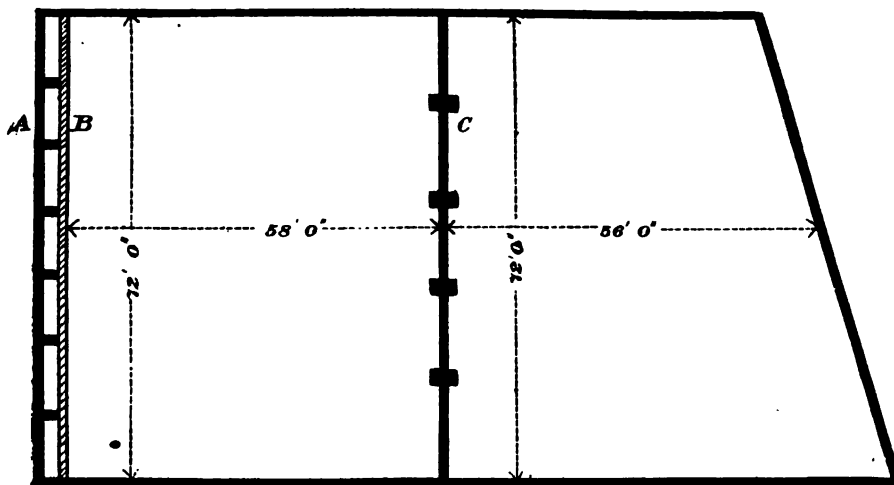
Tanks as first built at Paper Mill near Burnley.
